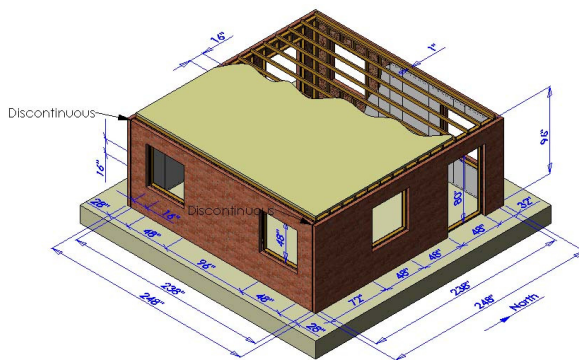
Full-size, wood-stud frame structure with sheathing, ties and clay masonry veneer, interior gypsum wallboard.
